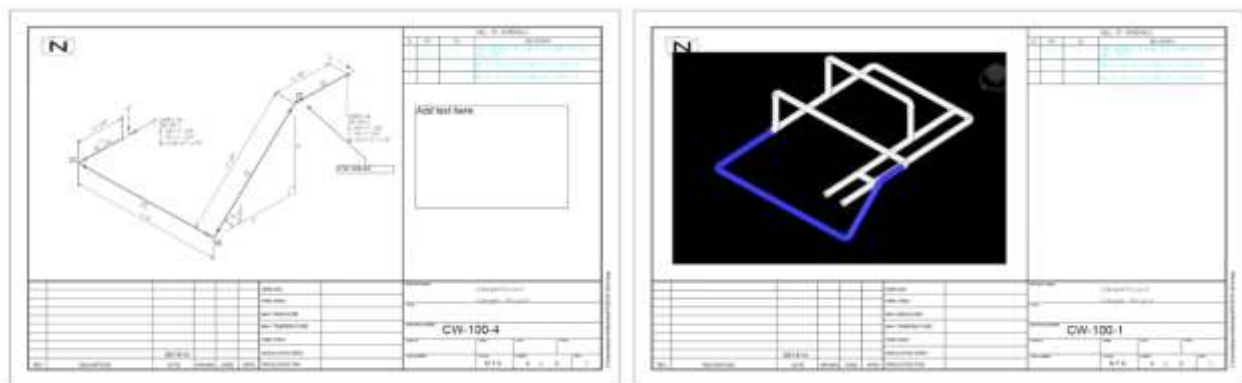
Two-Sided Isometric Drawing – Spool 1
